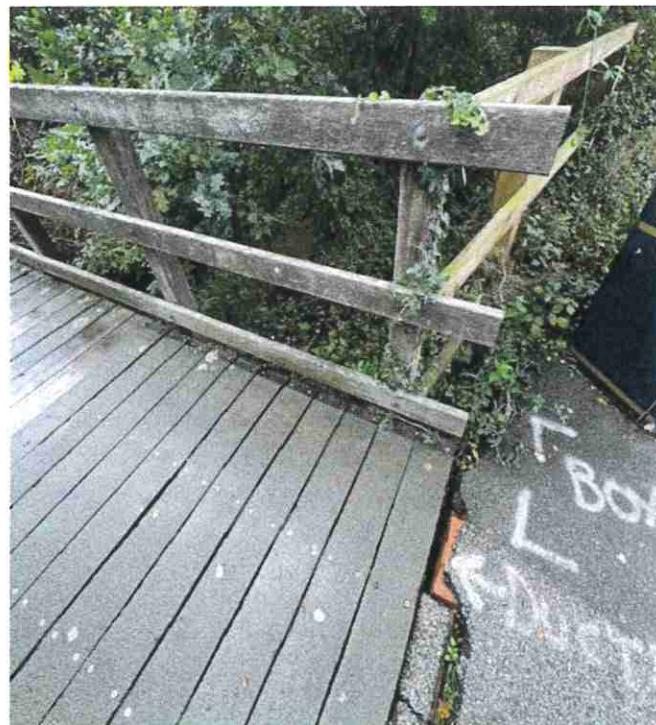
Existing bridge showing the tarmac pavement cracking at abutment with the bridge
